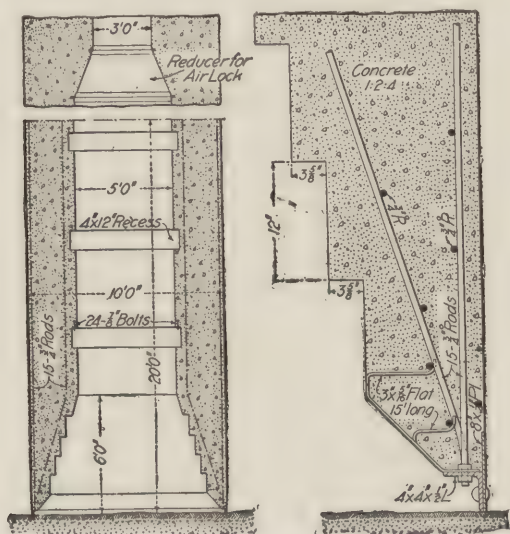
Pneumatic Caissons of Reinforced Concrete for Bronx Viaduct of New York Connecting Railway.
